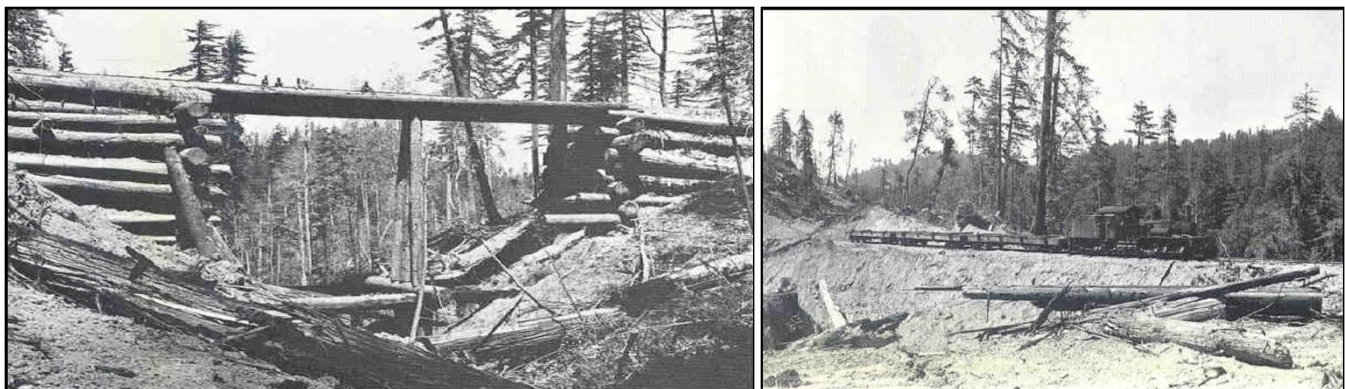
Rail crossings on Old Haul Road circa 1940s. Left, crib log box culvert. Note the men sitting on top of the crossing. (Santa Cruz Lumber Company photo (1943)). Right, example of large fill embankment. (Jack Gison photo (1947)). Both photos referenced in Dwight Ennis, <http://www.santacruzlumberco.com/index1.htm>
